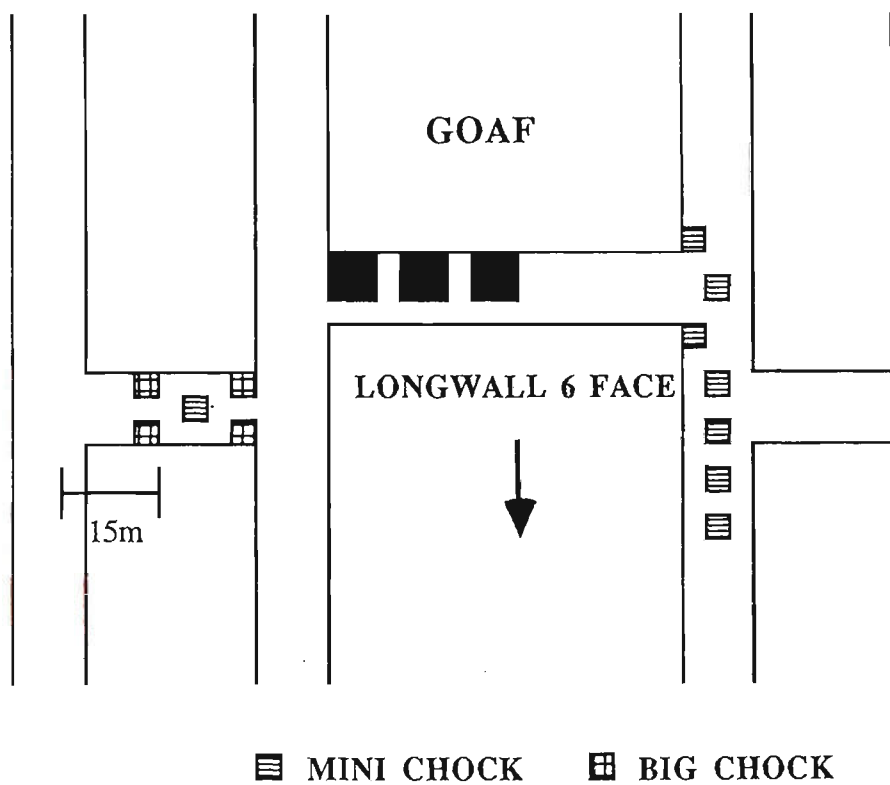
Layout of wooden chock installations per 60m of Longwall 6 gateroads at Tahmoor Colliery.
